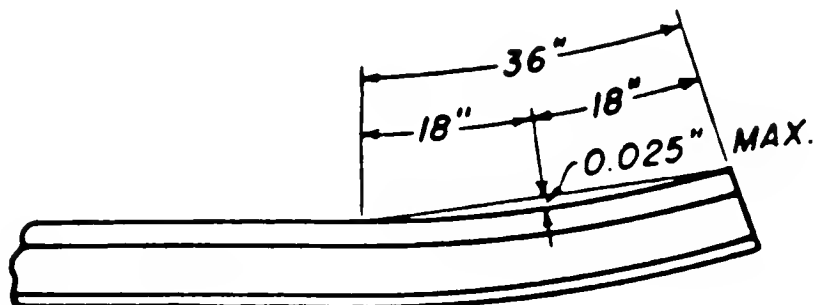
Side Elevation of Rail Uniform Upsweep Tolerance at Rail Ends per Section 13.3
